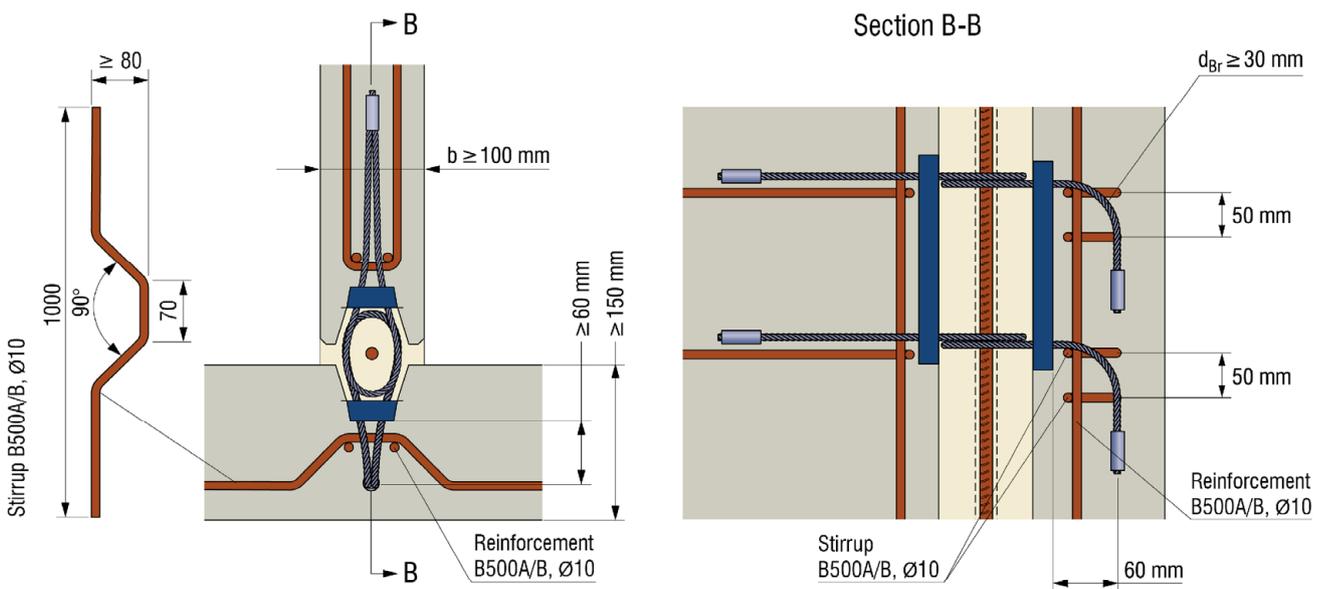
Wall – Wall – T-Connection - Detail with bended wire loops
